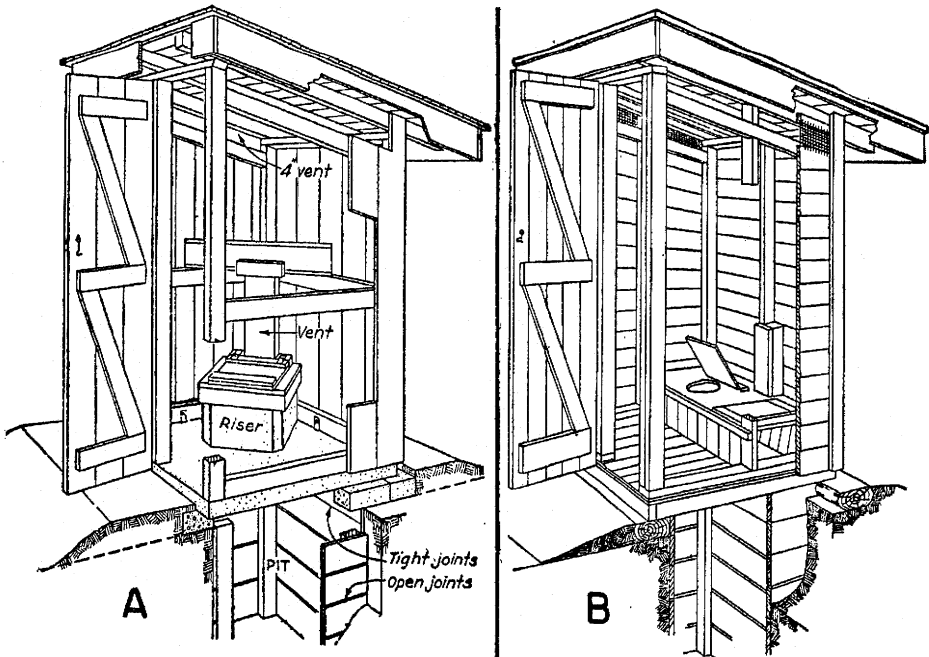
Sanitary pit-type privy construction. A, concrete slab and diagonal riser. Detailed plans and bill of materials available from U.S. Public Health Service, Washington, D.C., 20203 B, treated wood floor and risers.
